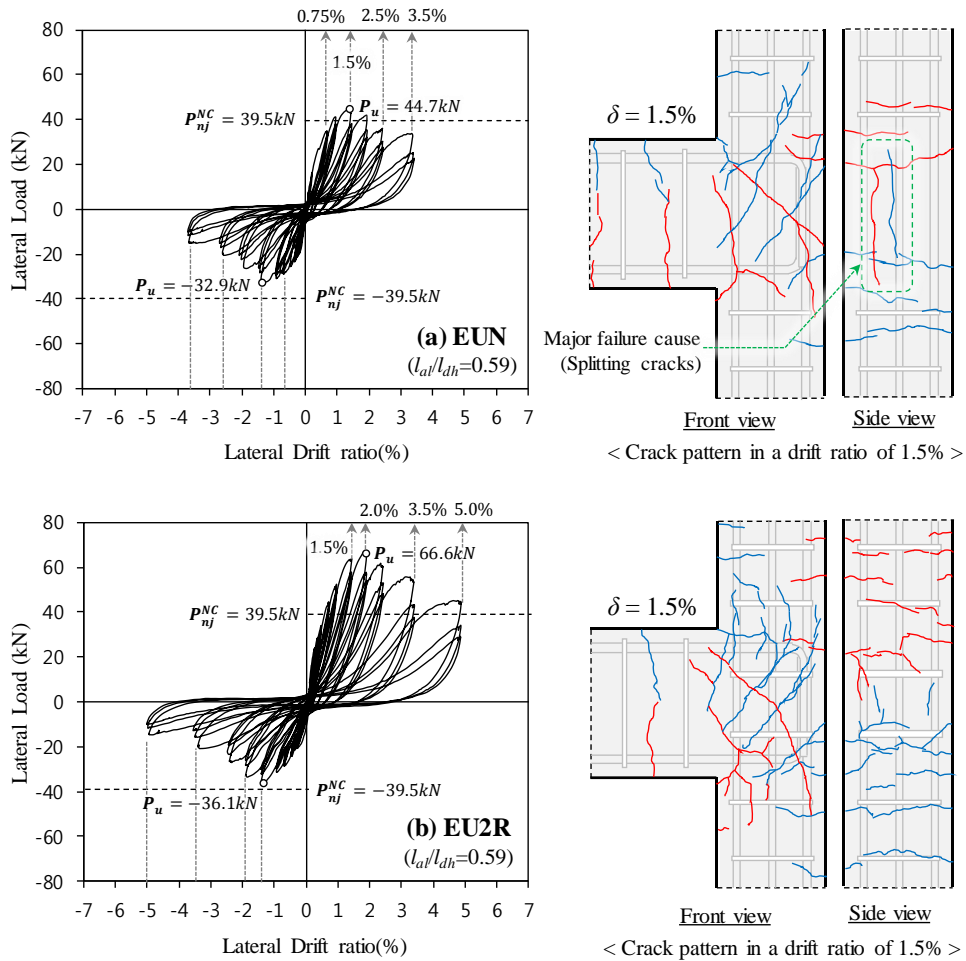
Test results of specimens EUN and EU2R with anchorage failure
